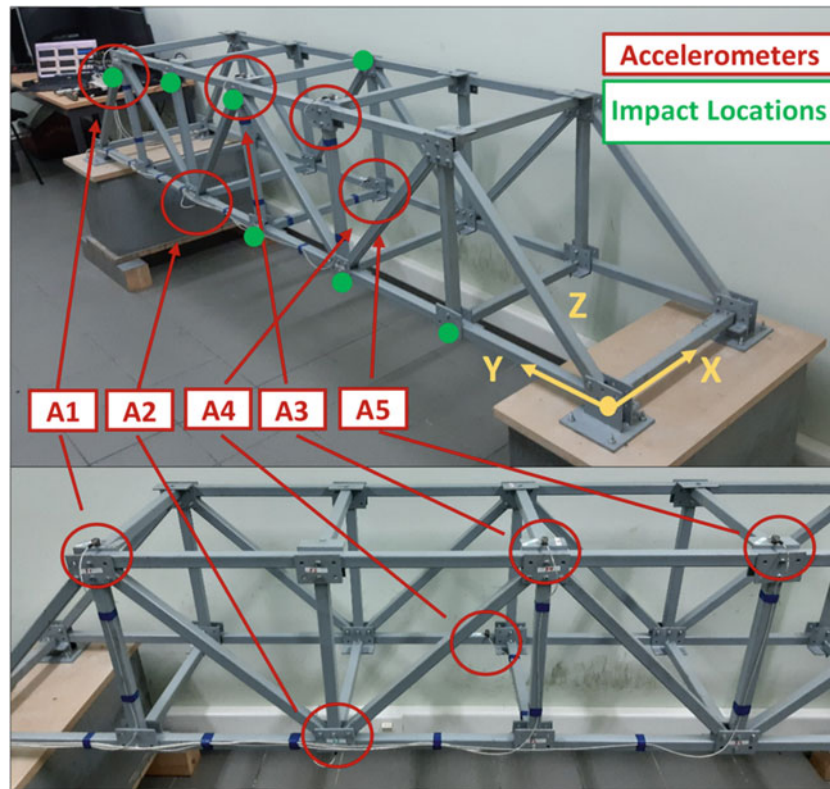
Experimental setup of a laboratory-scale truss bridge
